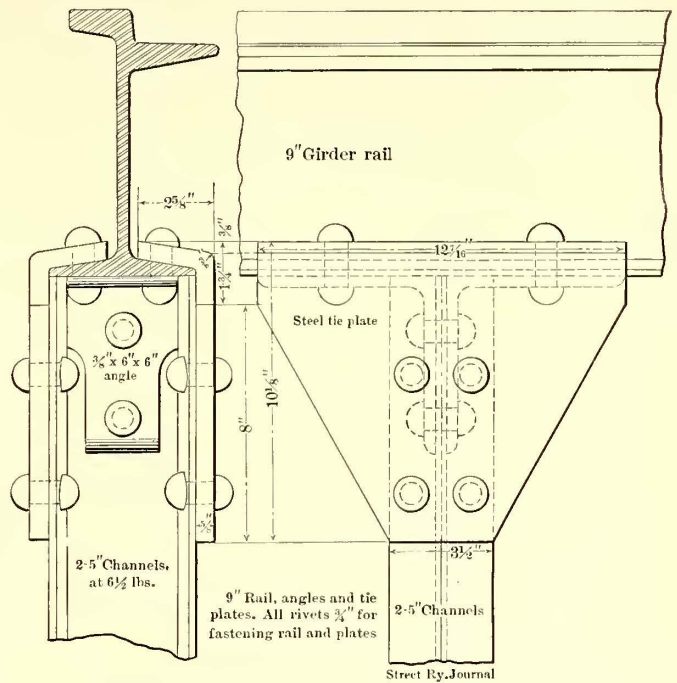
DETAIL SHOWING METHOD OF SUPPORTING RAIL ON COLUMNS IN PITS WITH DEPRESSED AISLES
